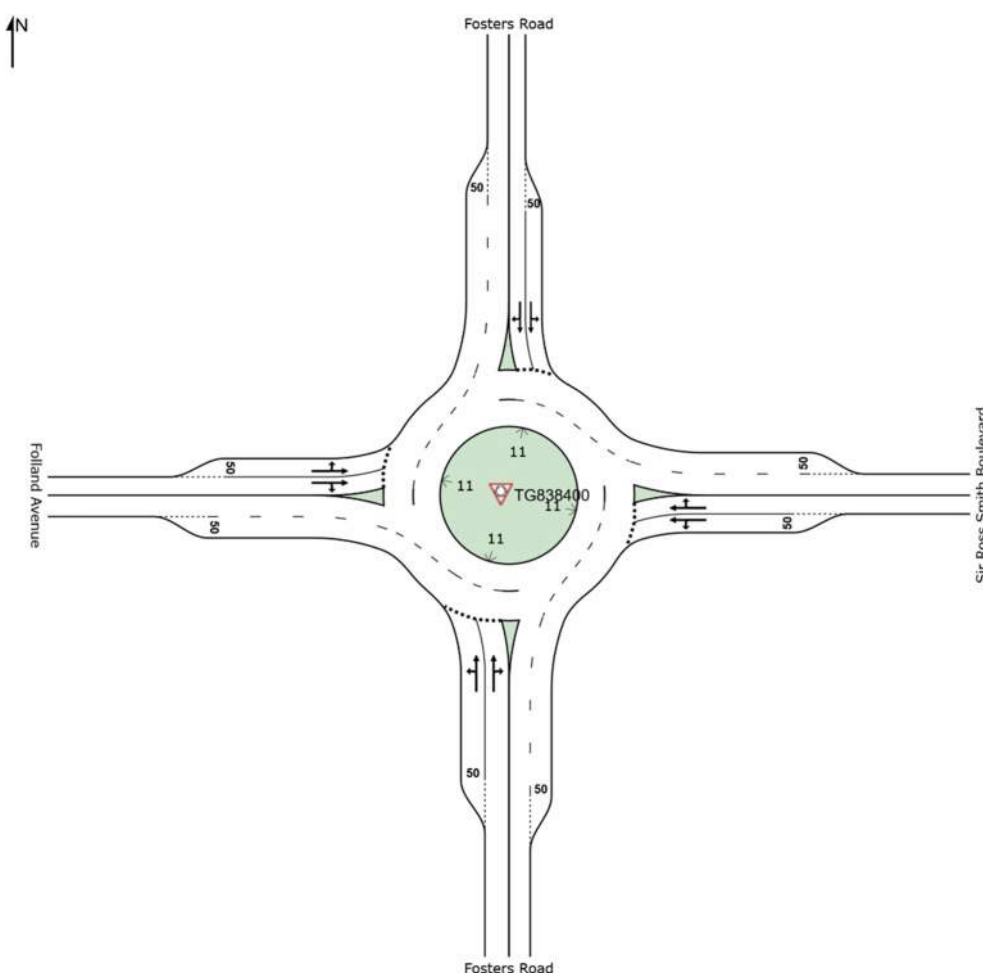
Fosters Road / Folland Avenue, suggested modified layout
